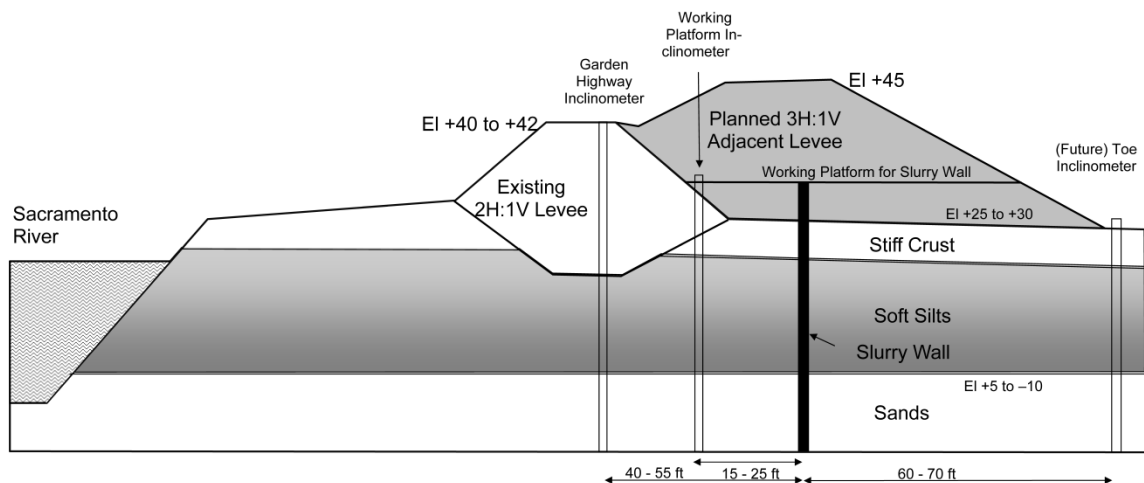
Typical SREL cross section with SB wall and location of inclinometers
